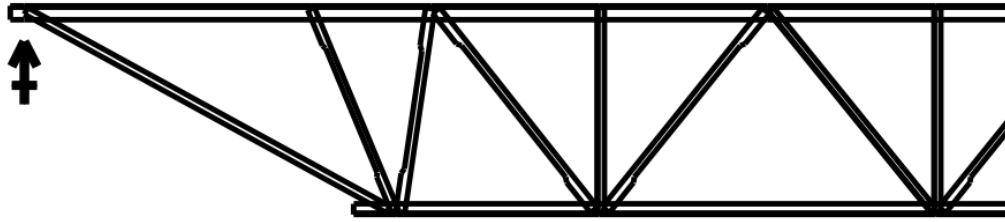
Joist with HRS sections and crimped angle webs (Joist I)
